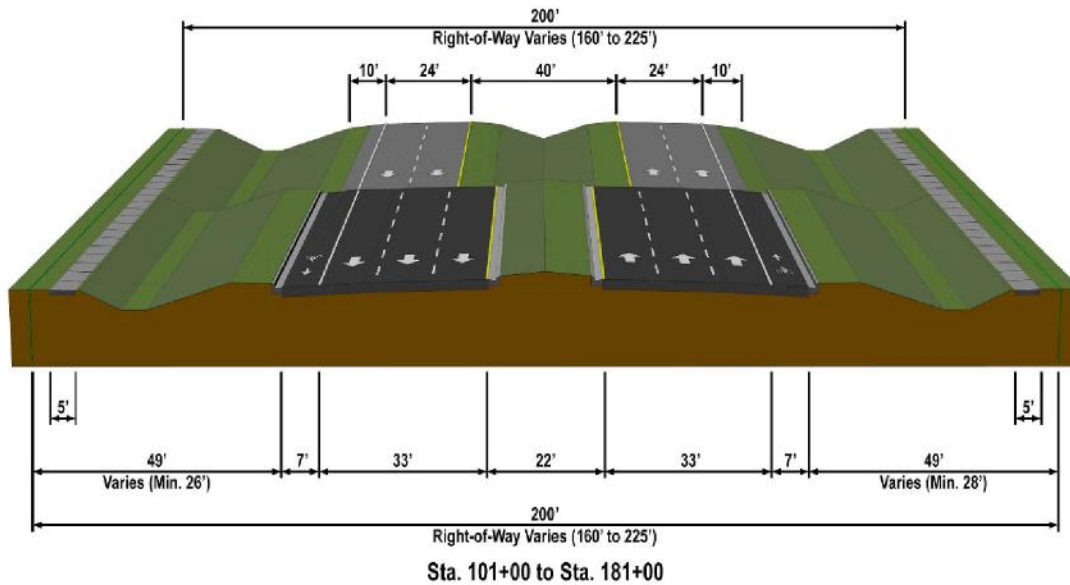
Urban Typical Section – Alternatives 1 and 2
